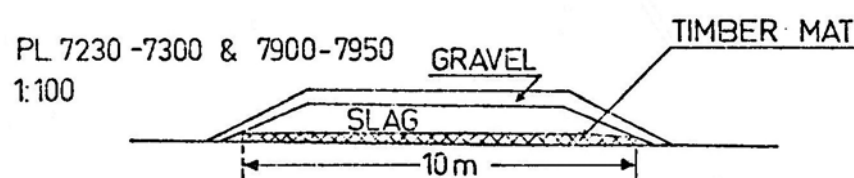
Widening of an existing road embankment with a timber grillage, Finland.
